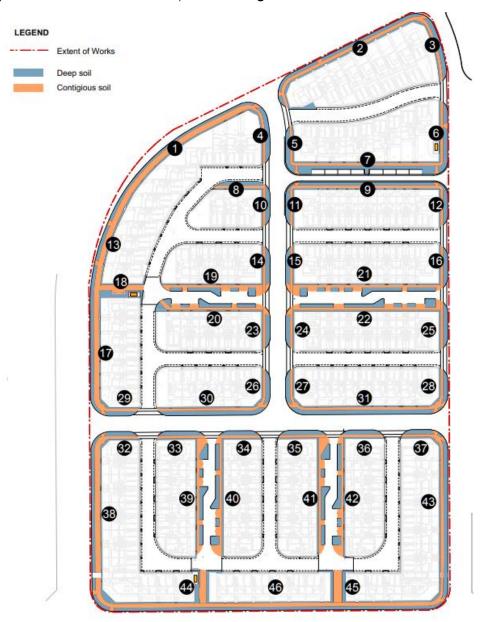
Extract: Deep Soil and Contiguous Planting Zones
